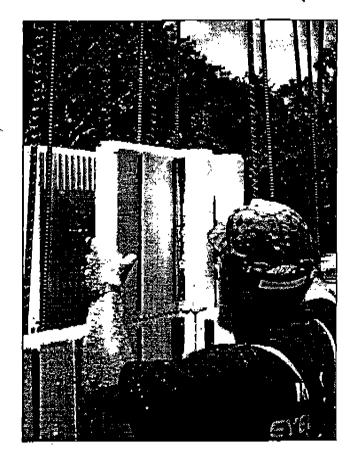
Concrete Placed Between Insulation Layers (PCA No. 67365)
